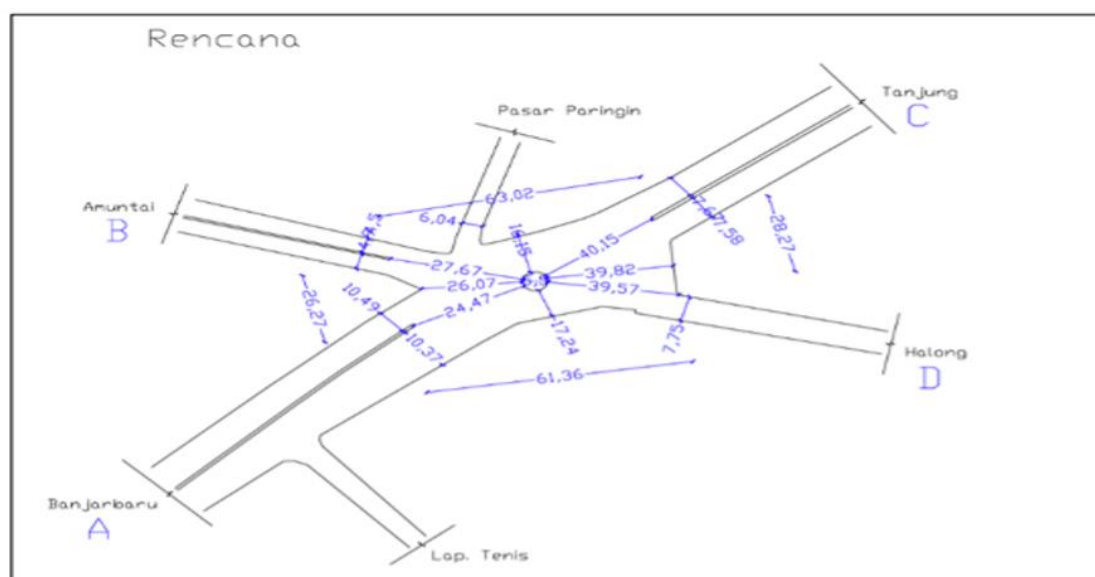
Existing Layout and Geometric Dimensions of the Paringin Intersection
